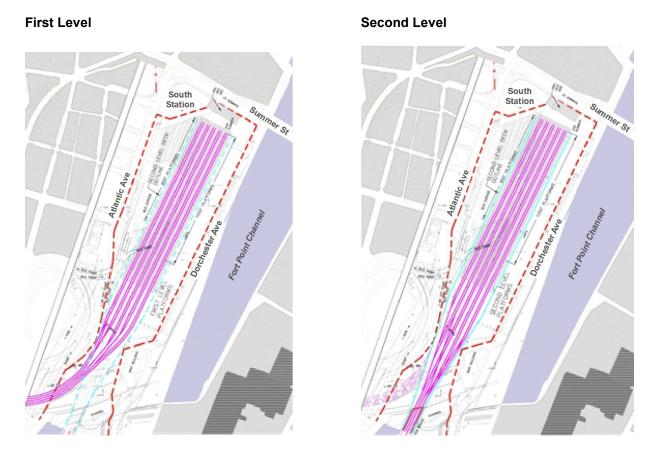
Unconstrained Rail Alternative 2 — Bi-Level South Station, Plan
